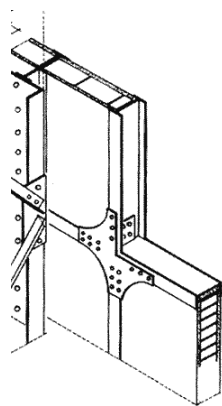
Detail of masonry wall in Istanbul’s Silahtarağa Powerplant showing brick infill with horizontal and vertical light-frame steel “I” sections. (Kıraç et al, 2003) This construction is similar to that shown in Figure 34 below.
